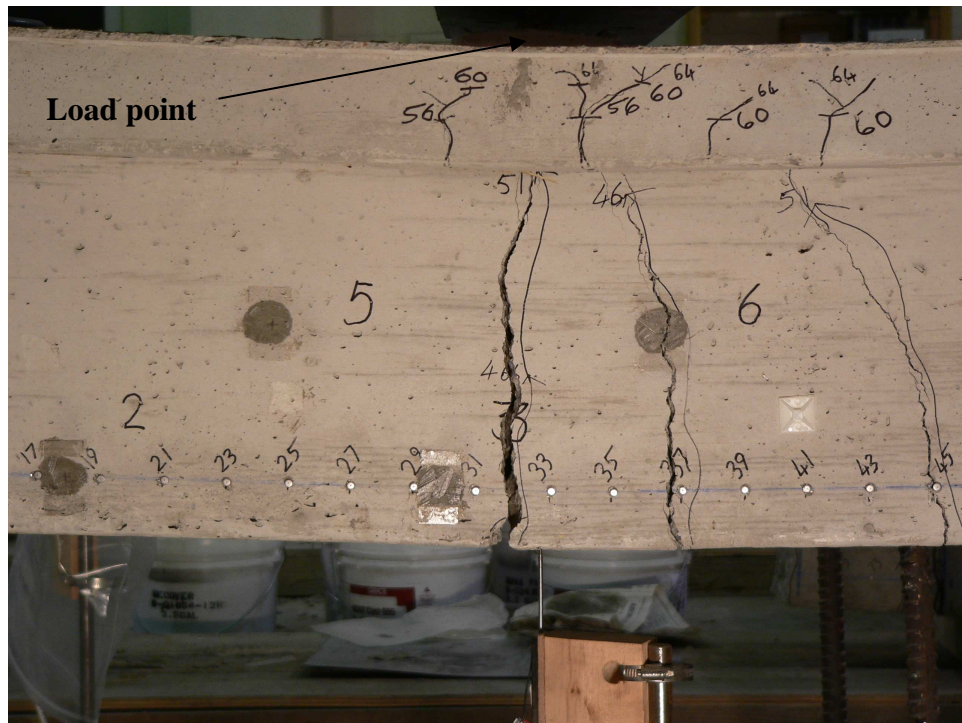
Final condition of flexural cracks at the end of test - SCC-MS-E
